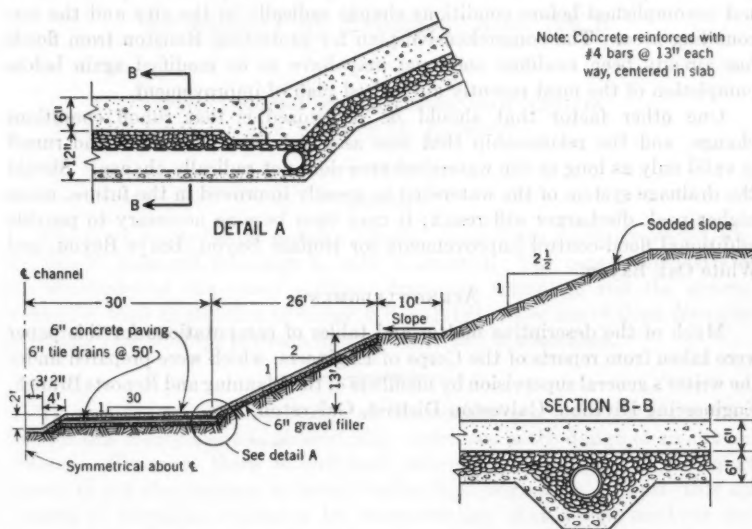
CHANNEL IMPROVEMENT AT BRAYS BAYOU
